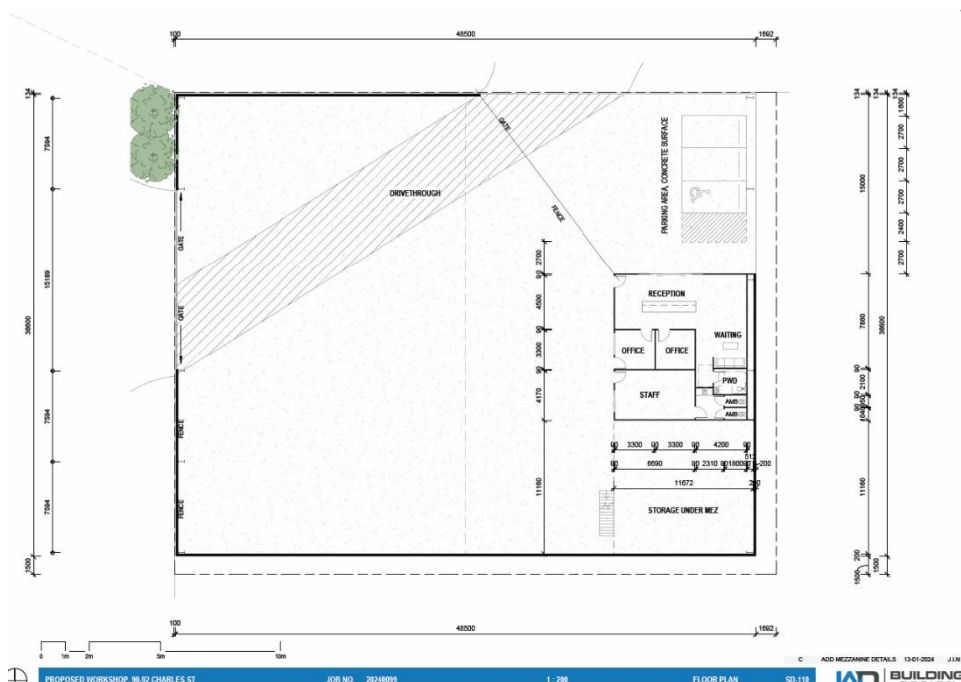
Proposed Floor Plan (Source: WD Building Design)
